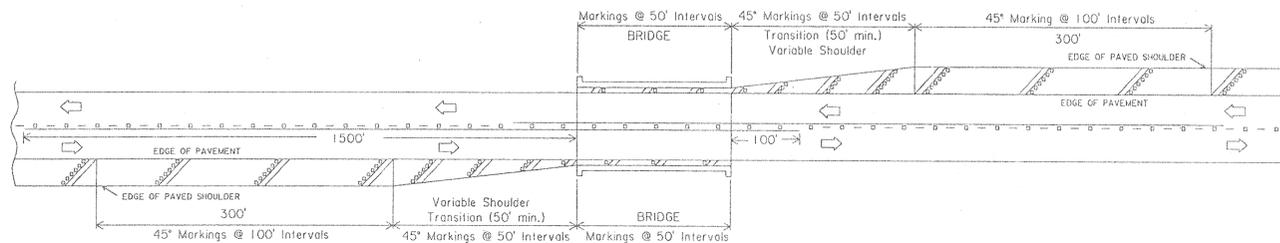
DETAIL OF OUTSIDE SHOULDER MARKINGS IN ADVANCE OF AND ON NARROW BRIDGES
